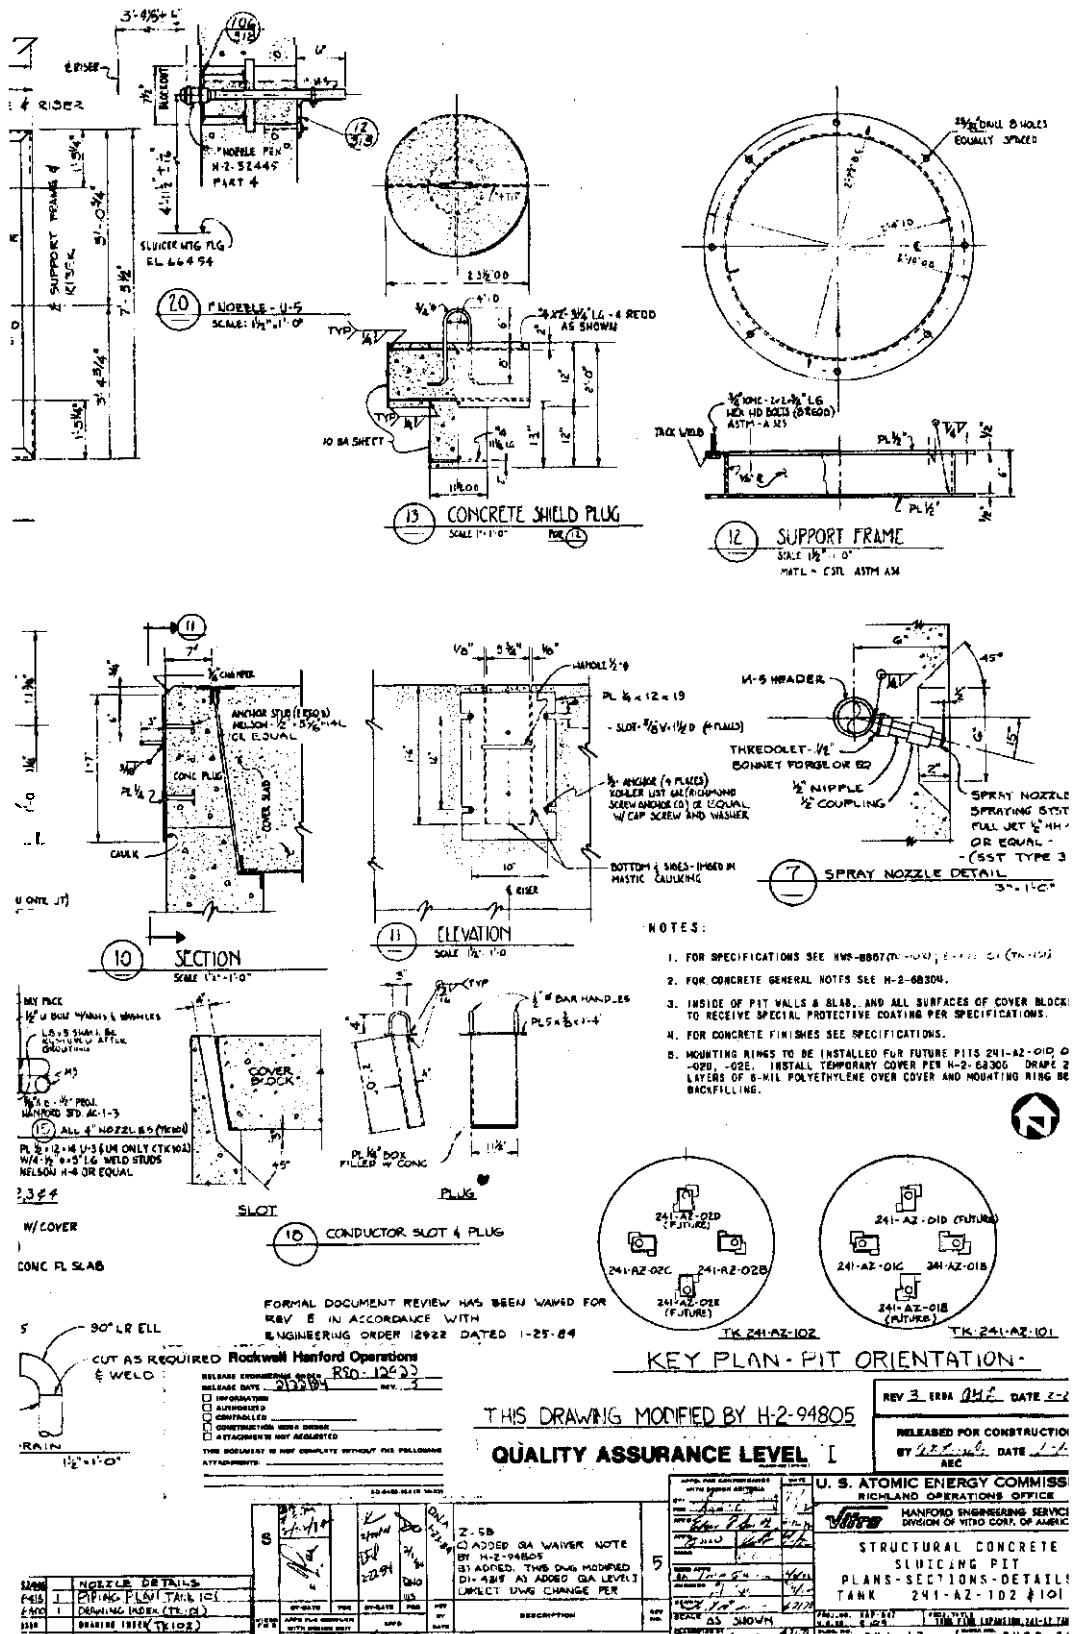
Structural Concrete Pump Pit Plans - Part 1 of 2.
